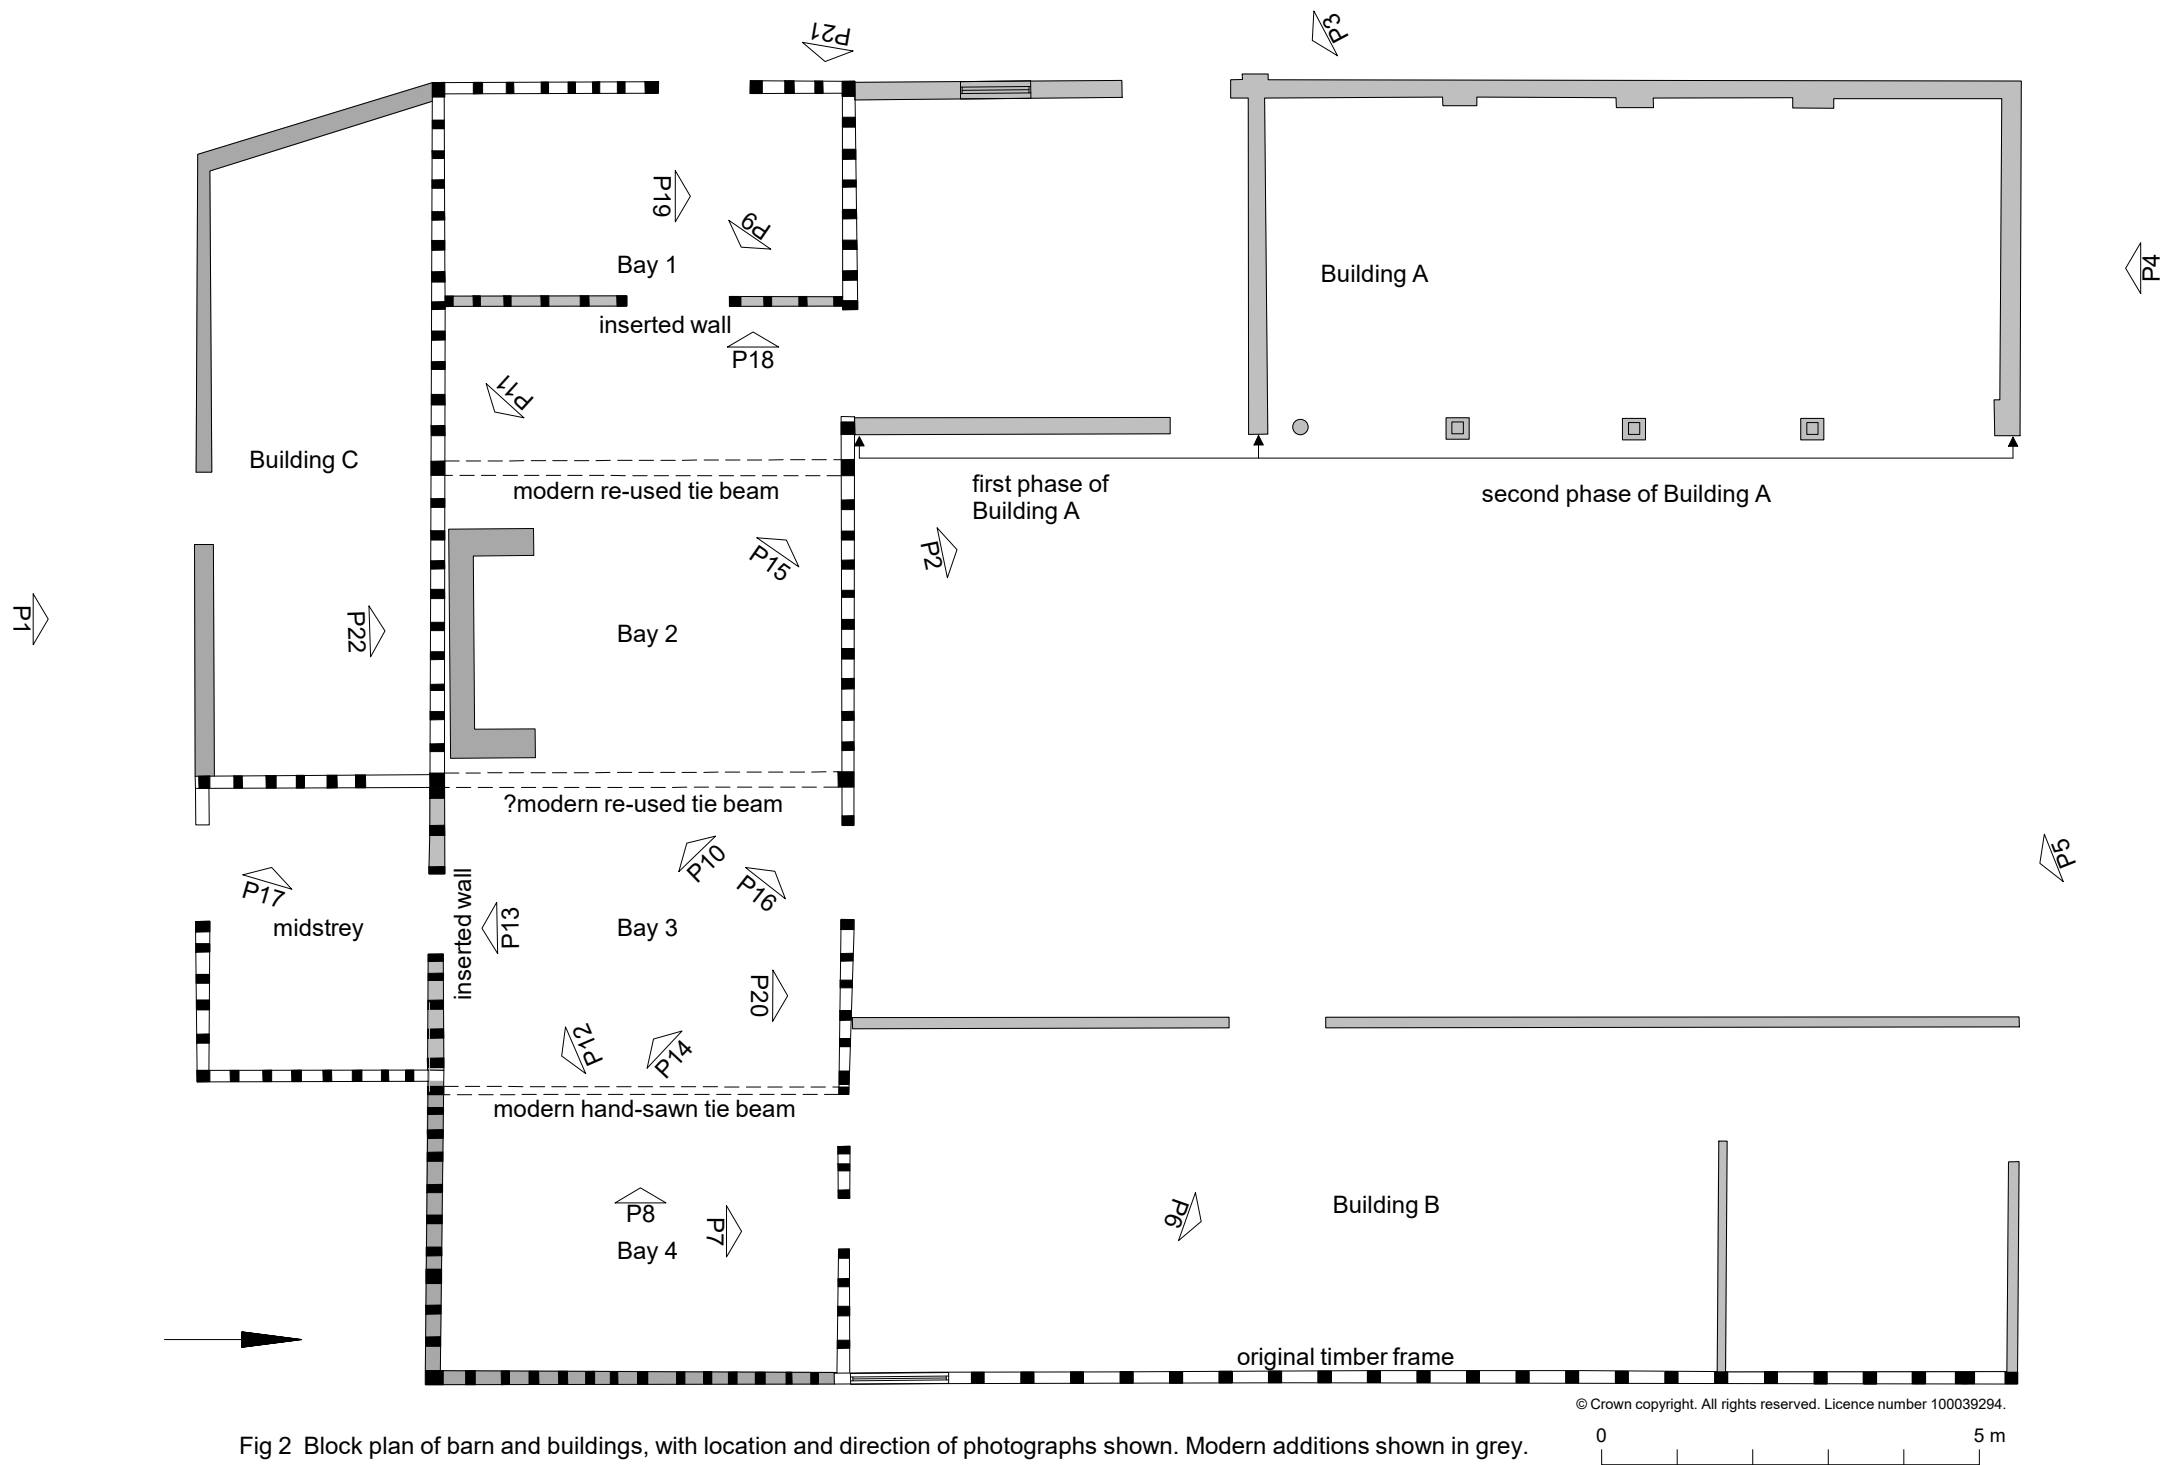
Block plan of barn and buildings, with location and direction of photographs shown. Modern additions shown in grey.
